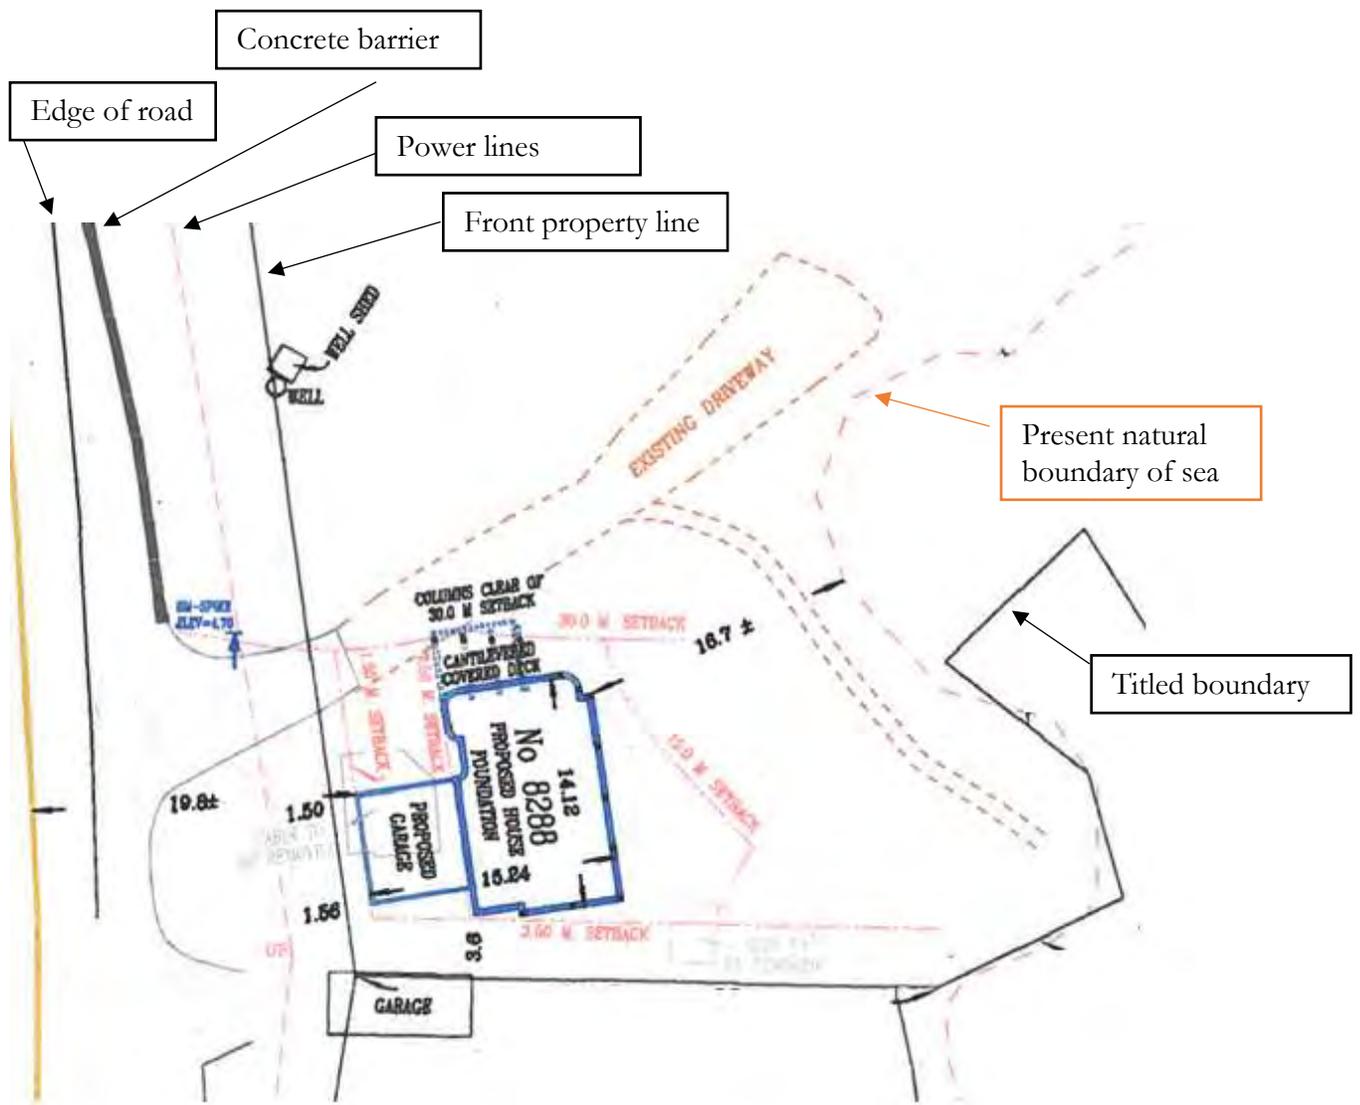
Building Envelope (Red Outline) with Proposed House Placement (Blue Outline), Property Lines (Thin Black Outline) and Center Line of Highway (Yellow Line)
